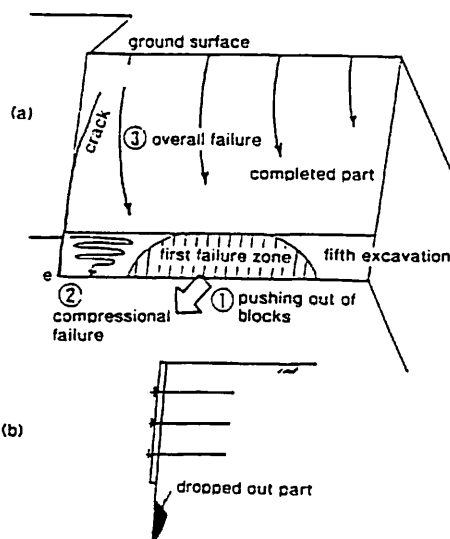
(a) Sketch showing a failure in a nailed wall under excavation, and (b) schematic diagram showing a local failure (Kimura, 1989).
